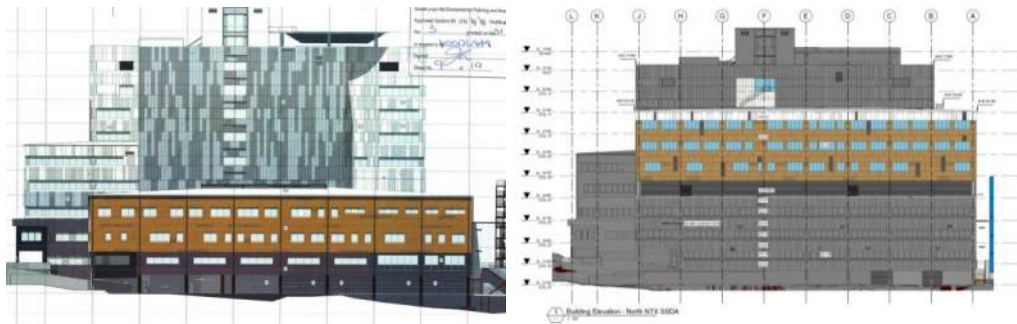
Approved vs Proposed Northern Elevation of Stage 3 (Source: CGA)
